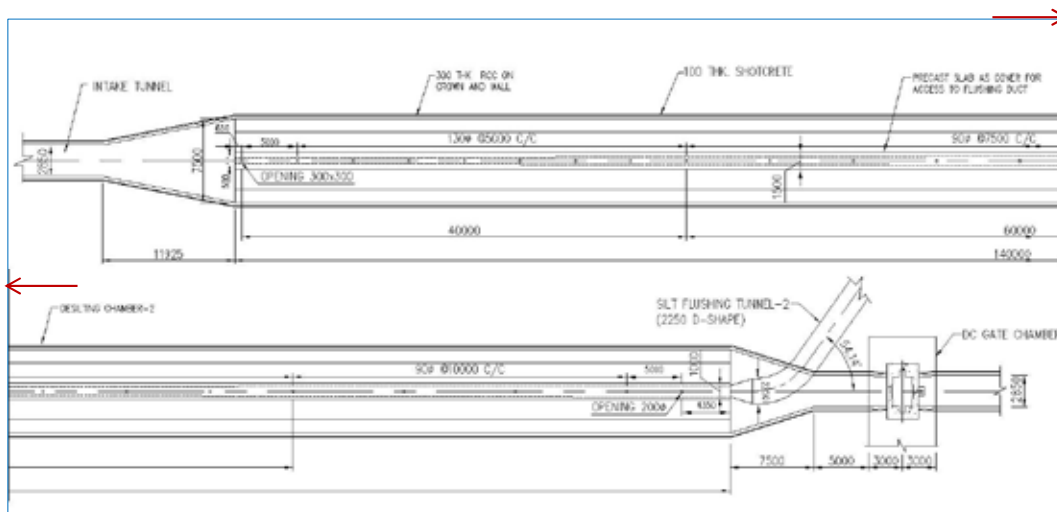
Desilting Chamber Plan with initial size & spacing of orifice in flushing duct slab
